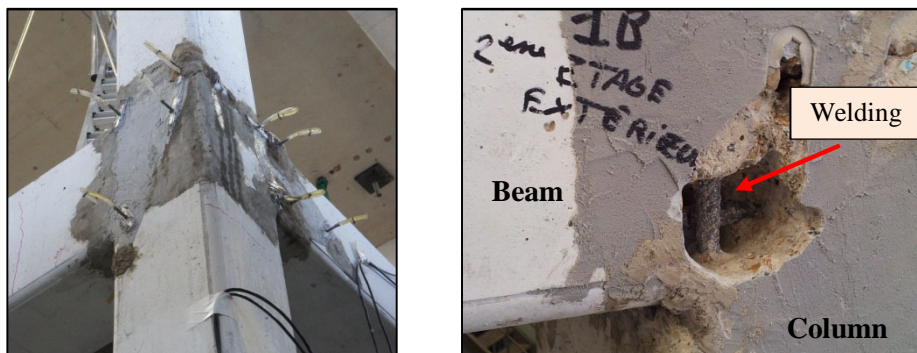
a) Injection of resins, and b) welding of beam bottom bars to column bars
